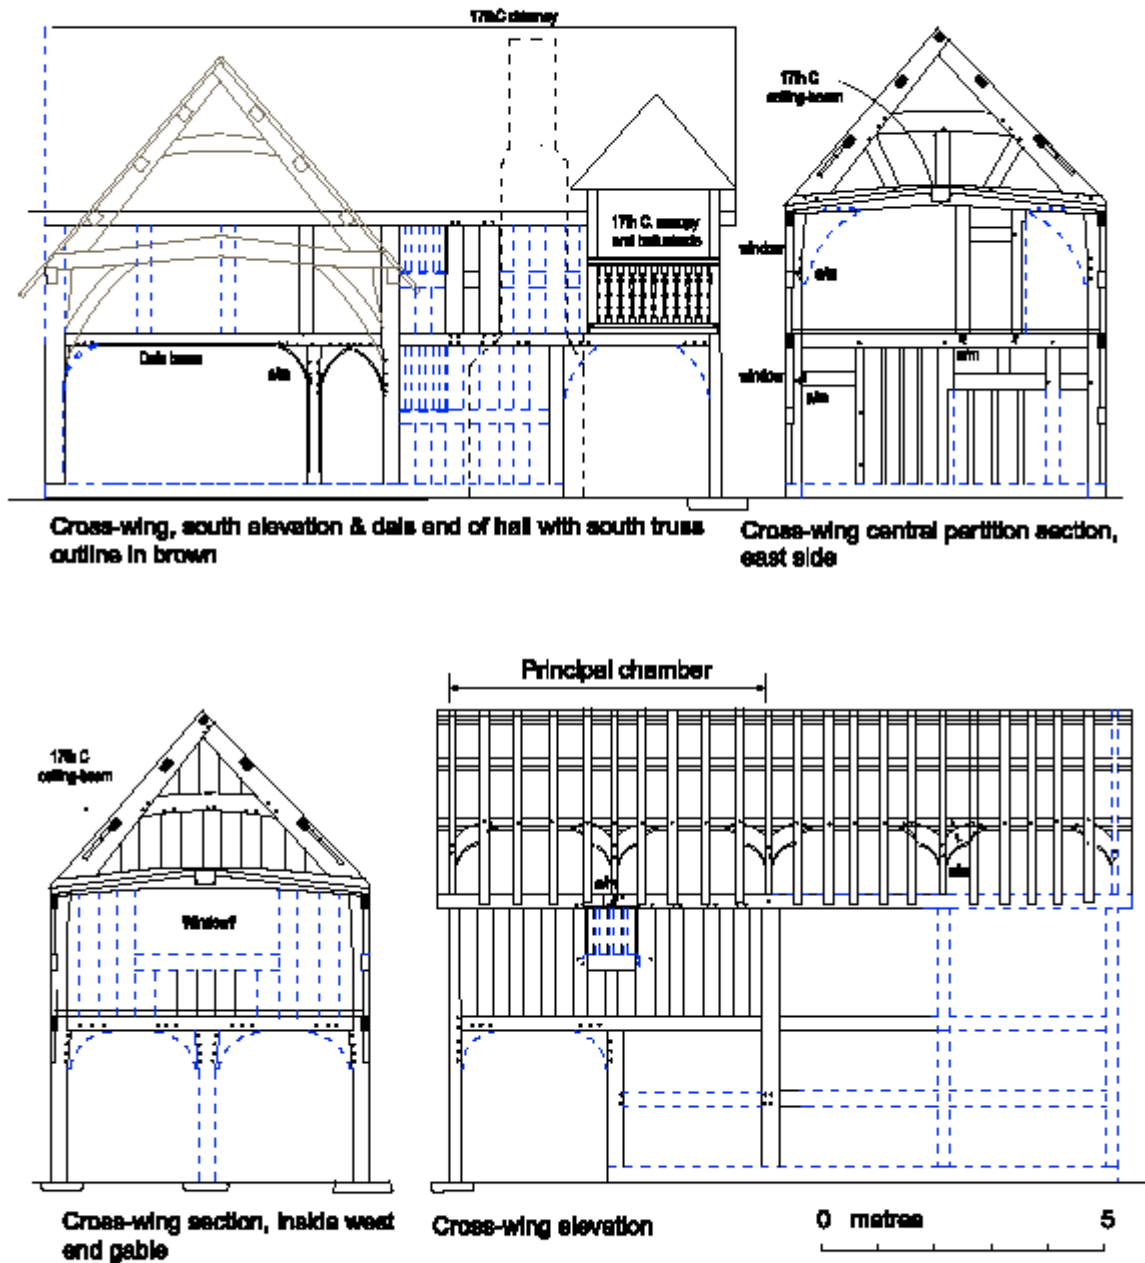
Reconstructed drawings showing the cross-wing sections and elevations with the hall truss drawn in brown against the dais canopy and reconstructed details in blue dash line.
